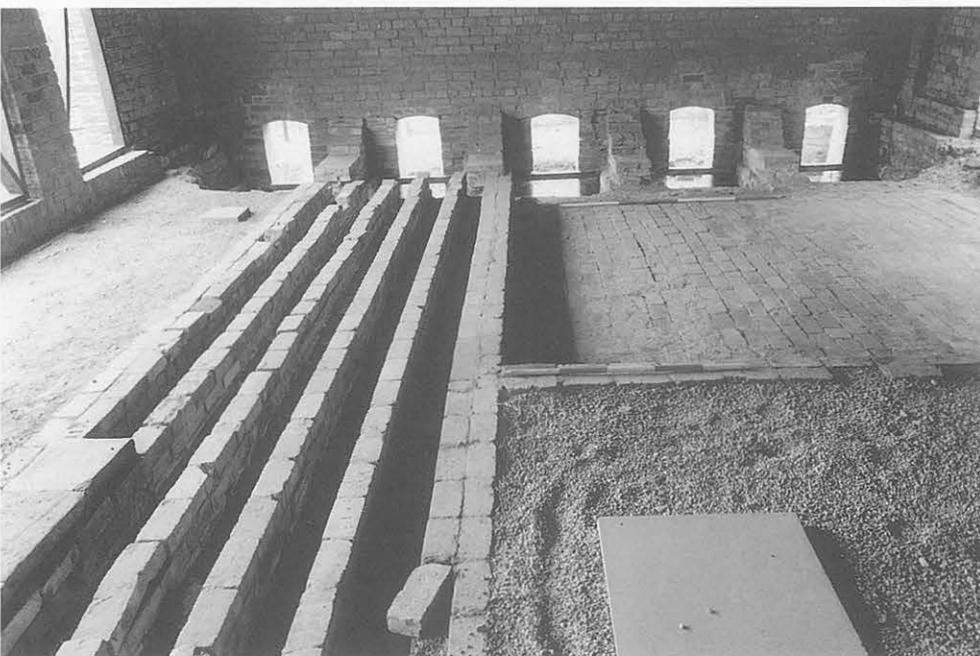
The interior of drying shed 1, looking north, photographed in 1998 after the completion of repairs. The hot air ducts are on the left and the working floor is on the right where the tiles were pressed into moulds on benches.
